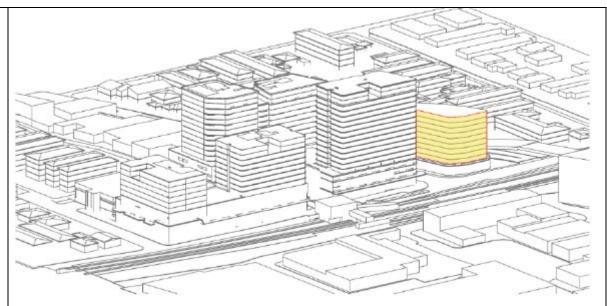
Redevelopment of 144–158 Cabramatta Road East
